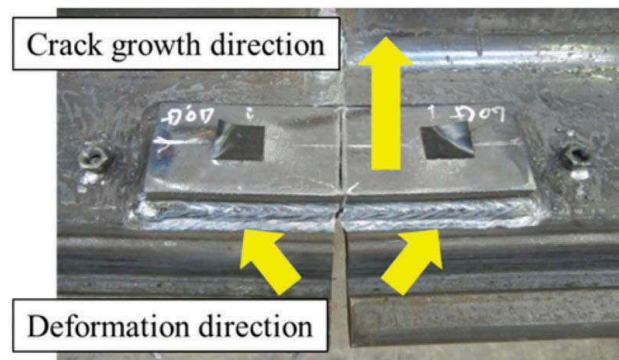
Deformation of splice plate welded on arm in web-side compression test (case1).
